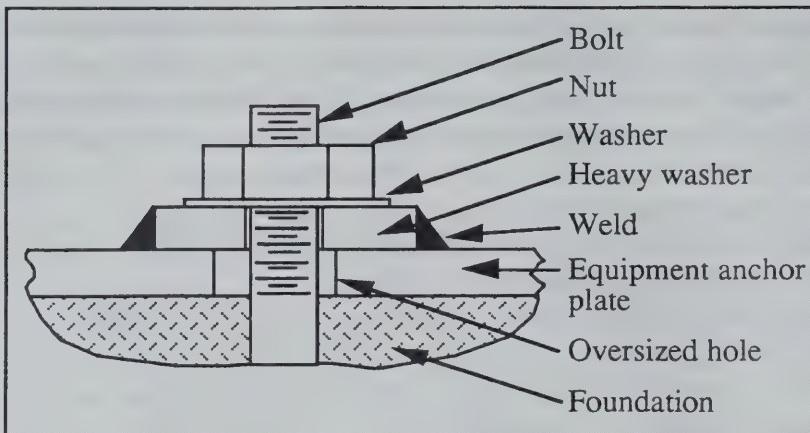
Thick washer welded to equipment to eliminate effects of oversized bolt holes.
